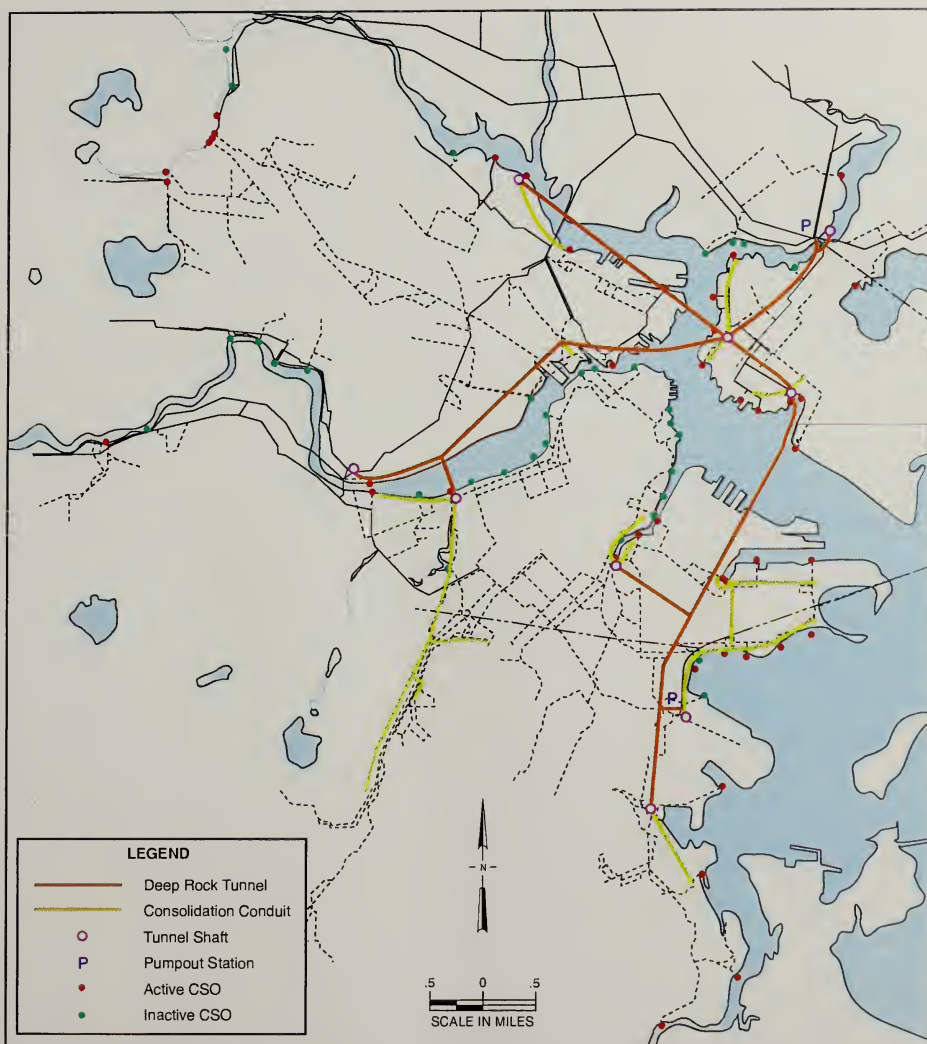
CSO TUNNEL PLAN FOR 3-MONTH STORM
